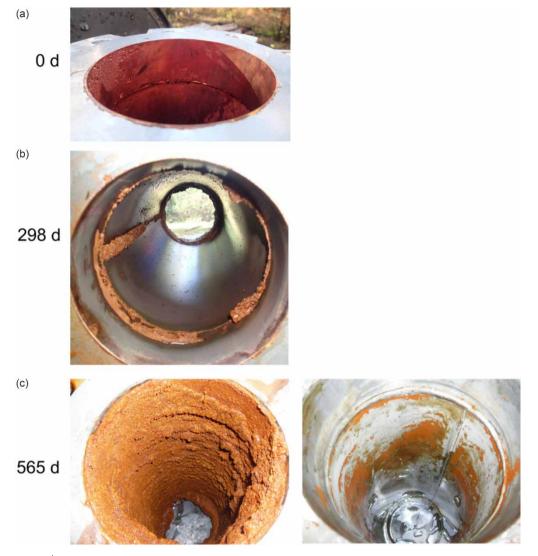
| Riser pipe of Well 2 (copper coating): (a) initial, fresh coating, (b) first inspection after 298 days, (c) inspection after further 267 days: (left) before cleaning, (right) after cleaning (photographs: Houben, Sander).
